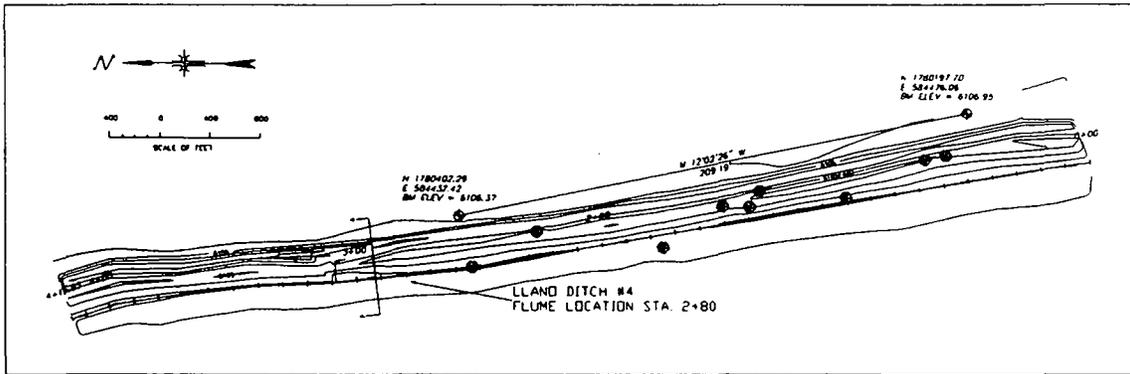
Location of the new flume for the Llano ditch #4 at station 2+80.
